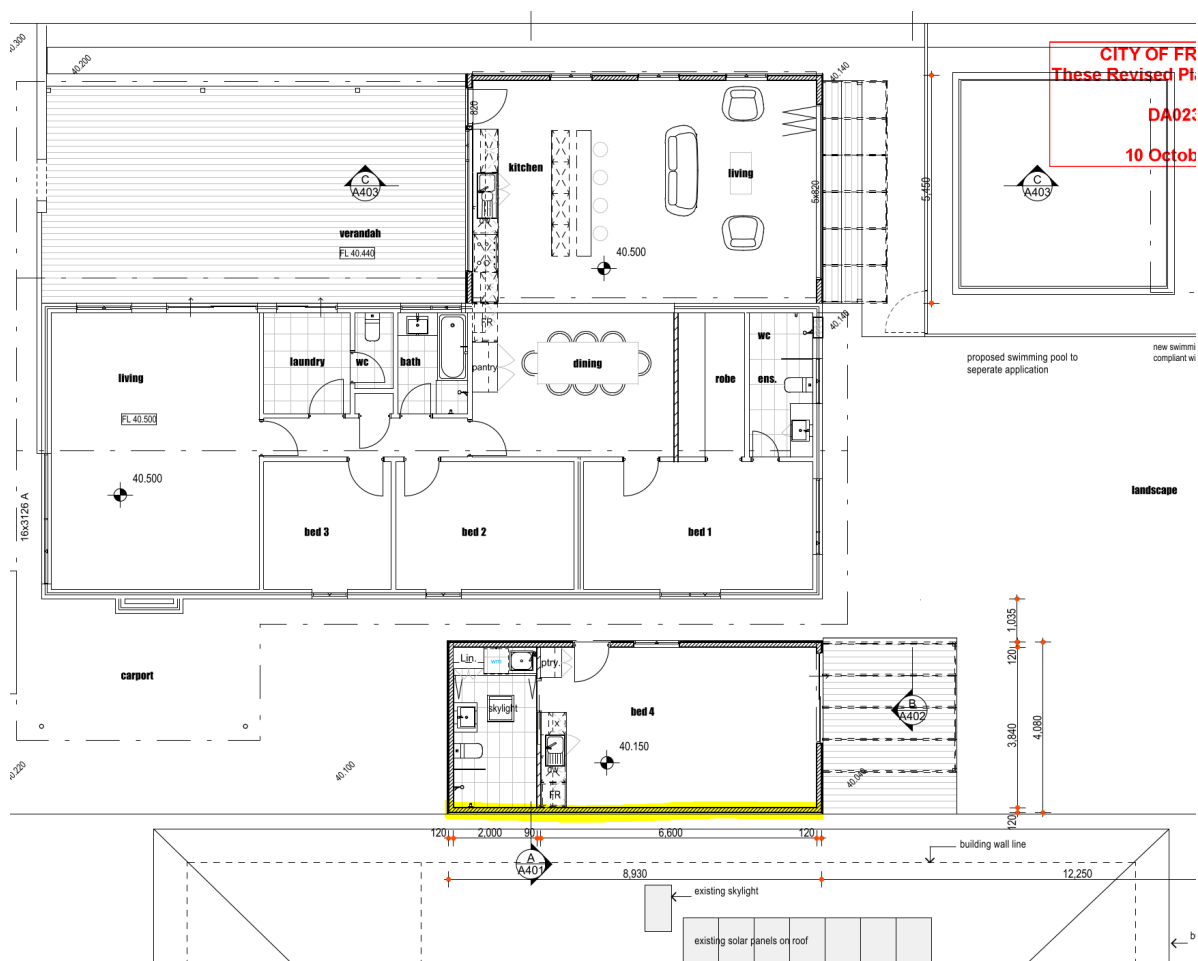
Floor plan showing location of proposed southern boundary wall in relation to southern adjoining property and existing dwelling
